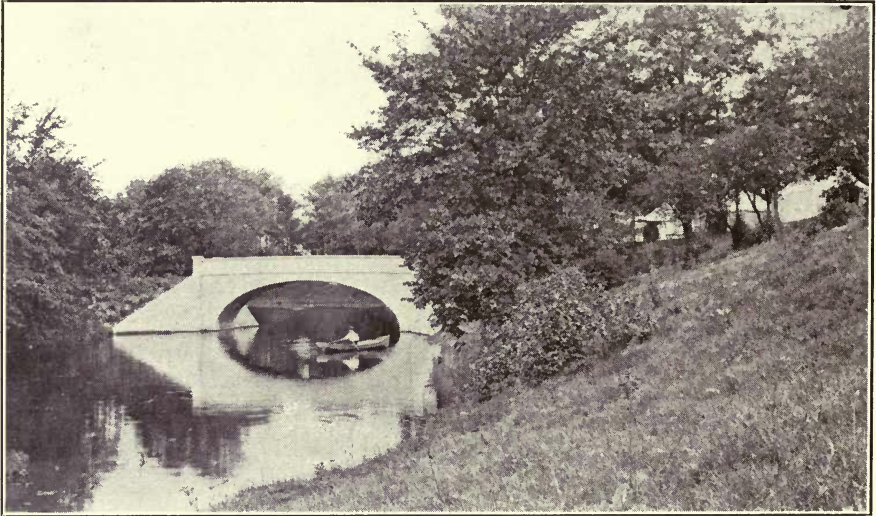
ARCH BRIDGE, DELLWOOD PARK, JOLIET, ILLINOIS.
